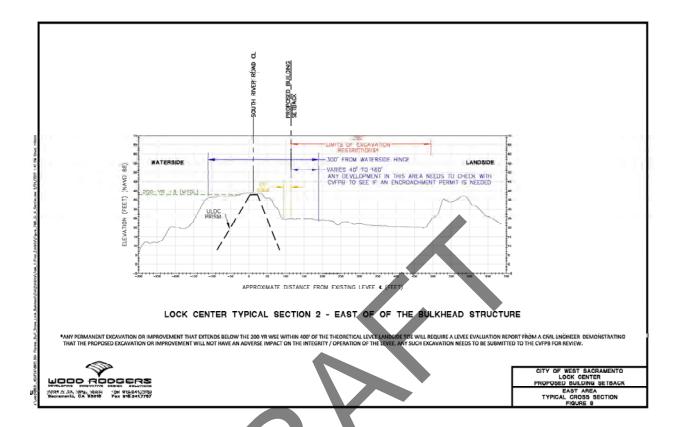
Locks Center Neighborhood (East) Typical Cross-section
